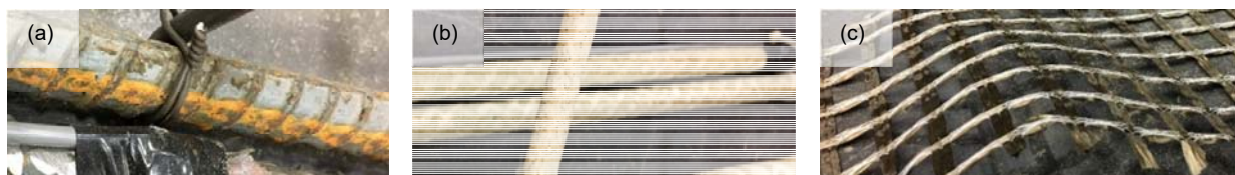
Reinforcement used in beams (a) Steel rebar (b) GFRP bars (c) Basalt mesh
